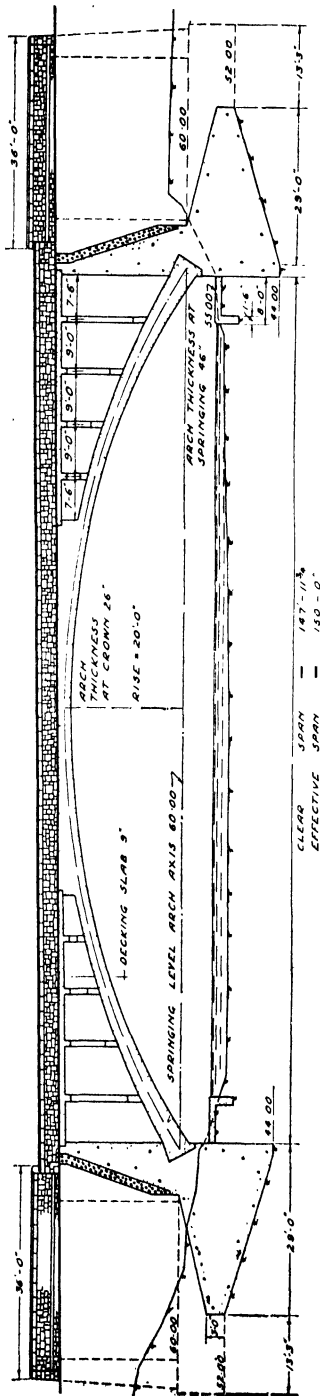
RIVER AWE BRIDGE: LONGITUDINAL SECTION.
